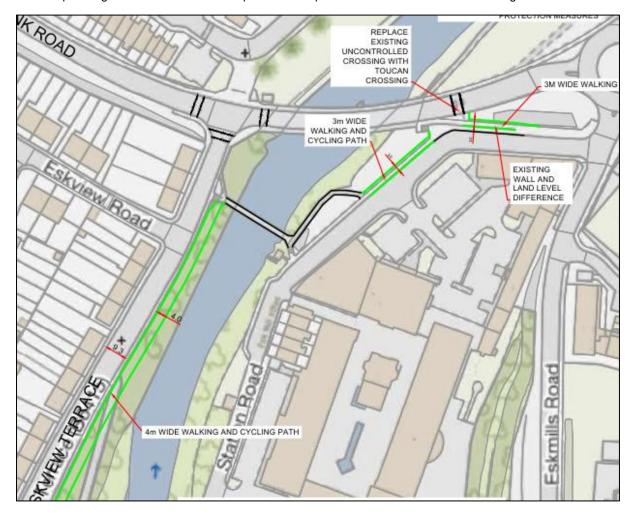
Route 5 Option A and B - Example of intervention (4m wide walking and cycling path on retaining wall in Haugh Park, new crossing across Olive Bank Road)
